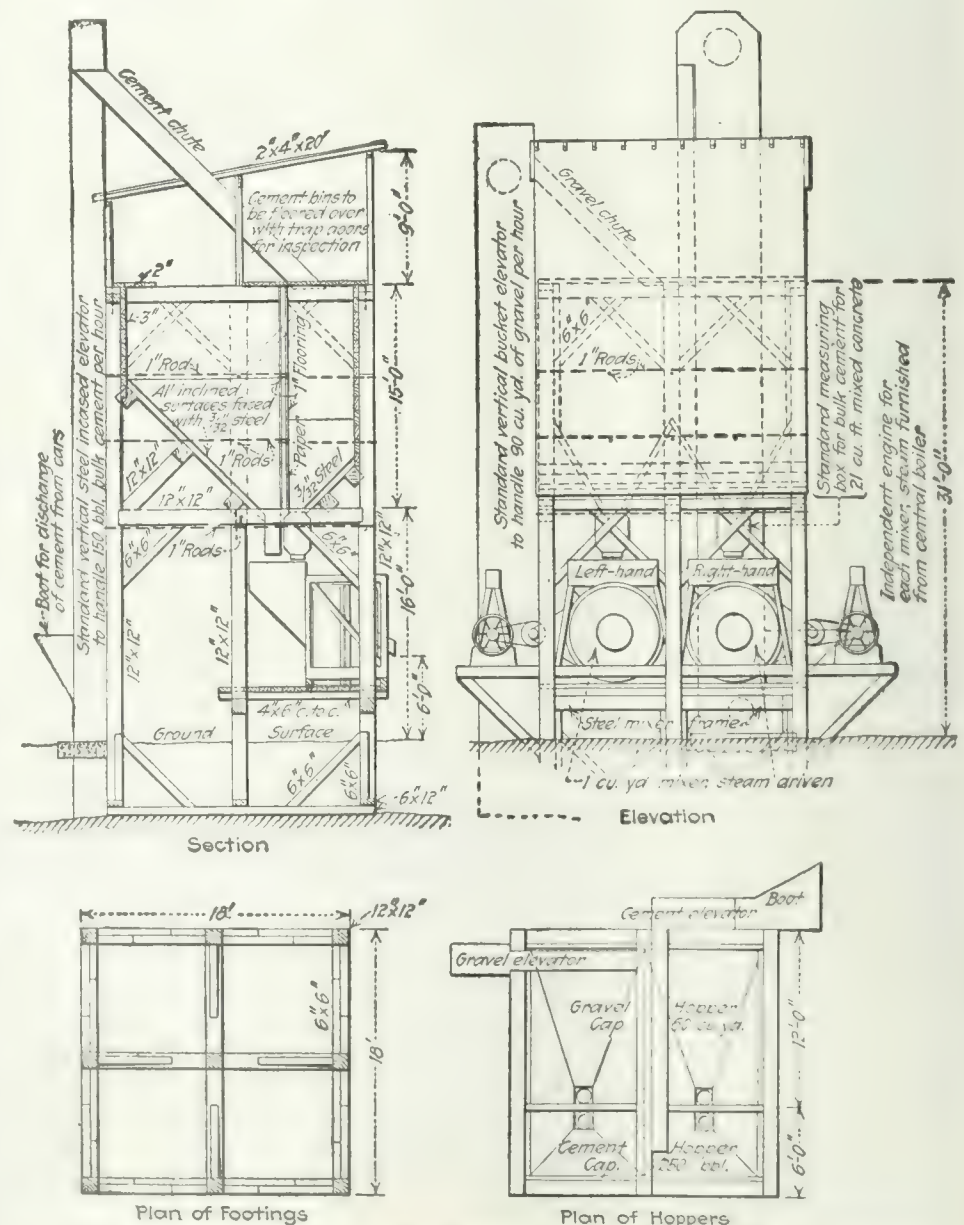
DETAILS OF MIXING PLANT WITH DUPLICATE MIXER EQUIPMENT
